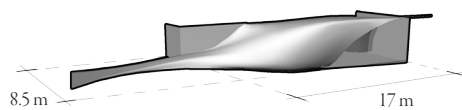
Lines in plan, elevation and 3d follow existent geometry and orientation considerations.
